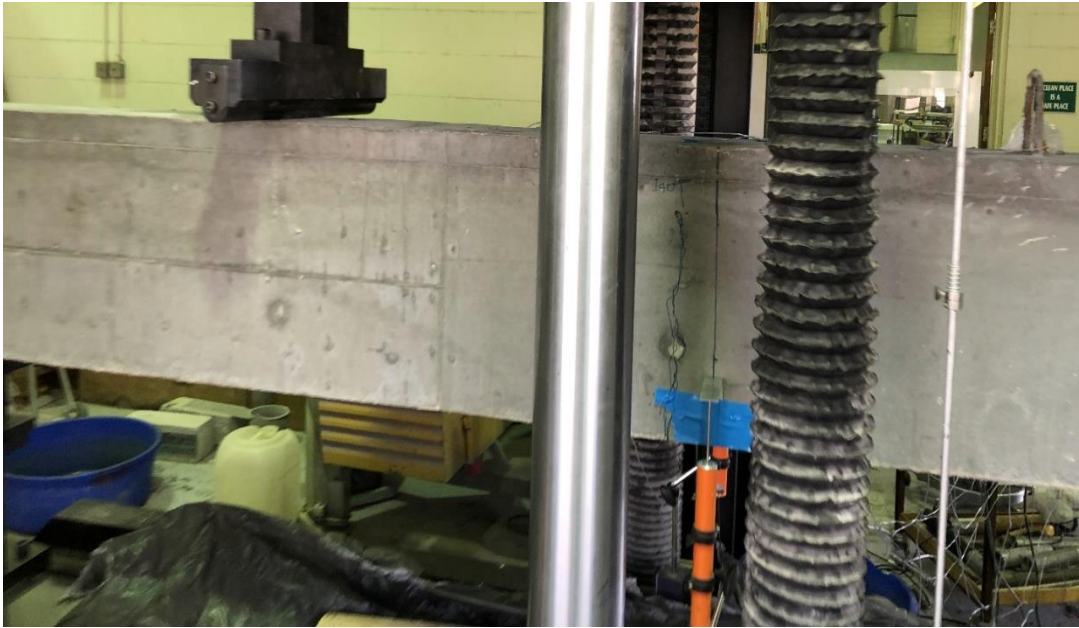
Failure of beam 11 (HWBFRP-10-600)
